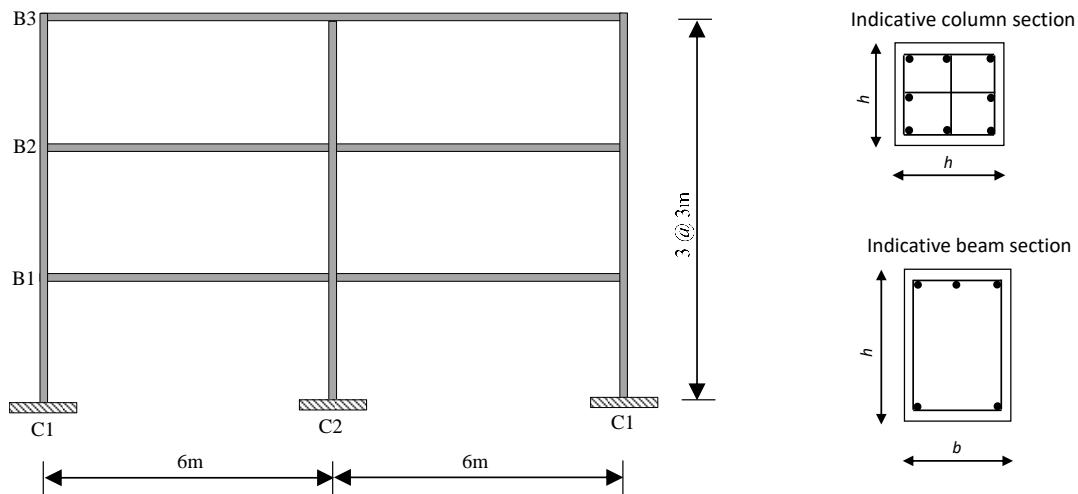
Three-storey two-bay reinforced concrete frame [56]
